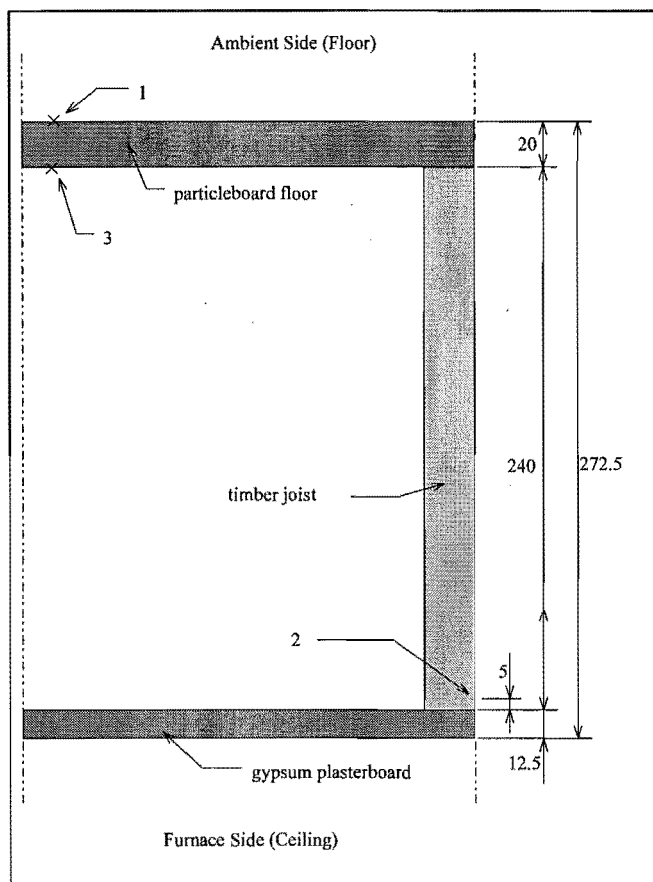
Layout of Floor System and Location of Failure Criteria Points
